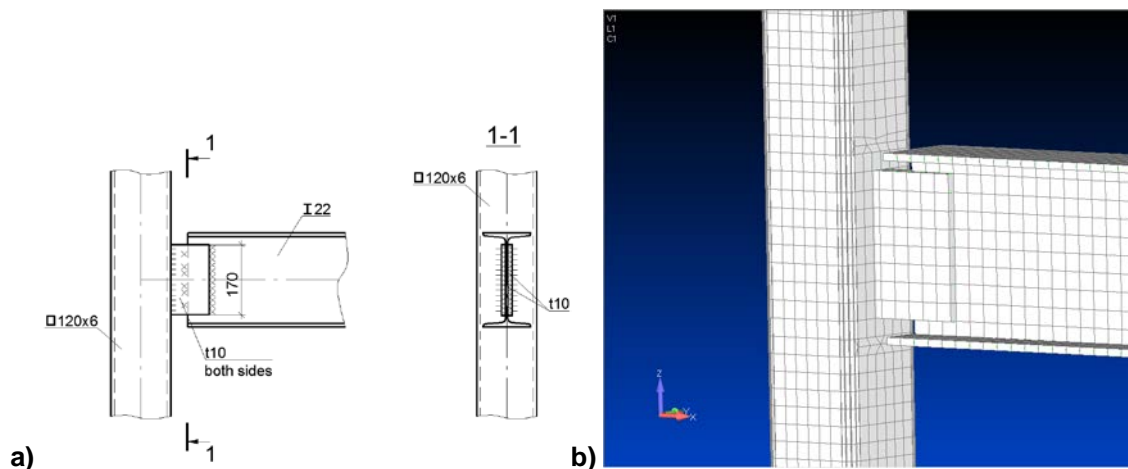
Hinged joint: a – constructive solution; b – finite-element model
